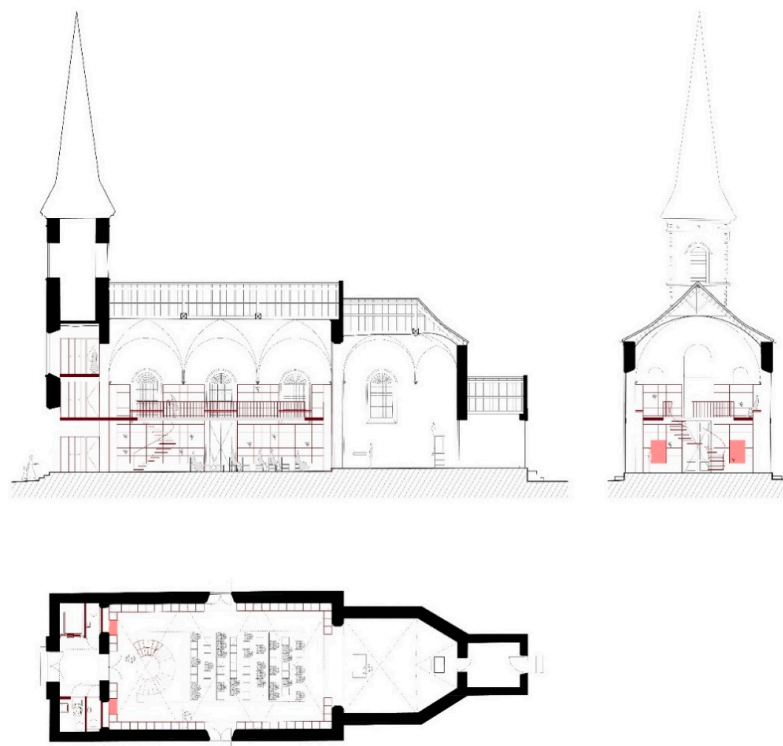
Columbarium church of St. Odulphus: floorplan ground floor with longitudinal and transverse section.
